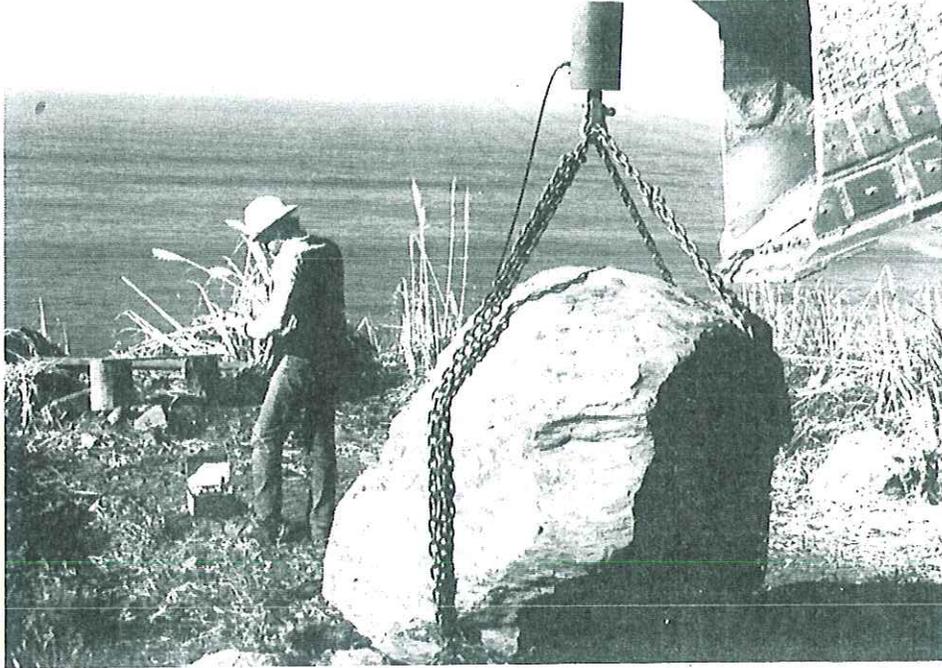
WEIGHING A 5-TON BOULDER USING A LOAD CELL ATTACHED TO THE BUCKET OF A FRONT END LOADER
